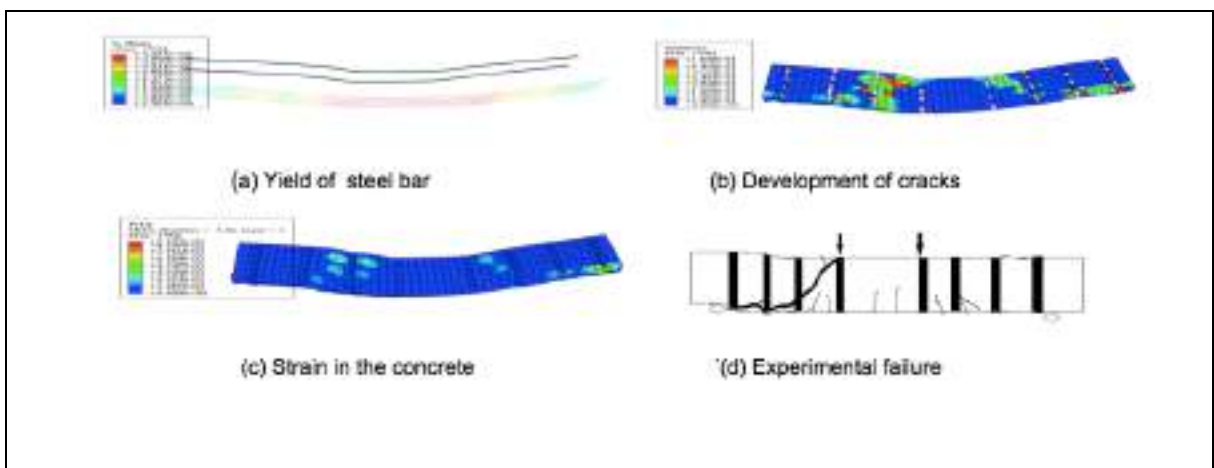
Mode of failure of beams strengthened with CFRP sheet (A10-M)
